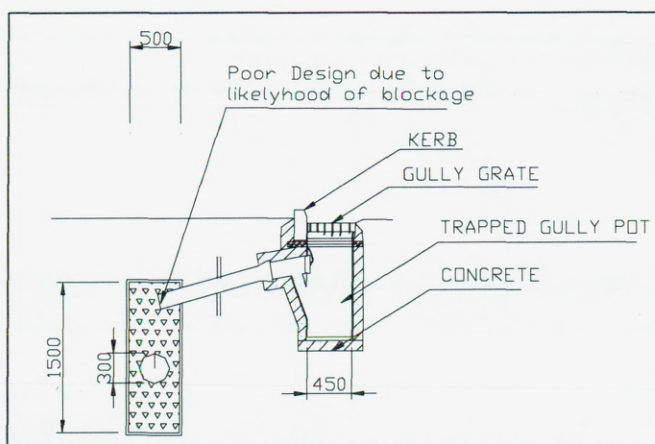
Detail of gully pot connection to filter drain at Lang Stracht
